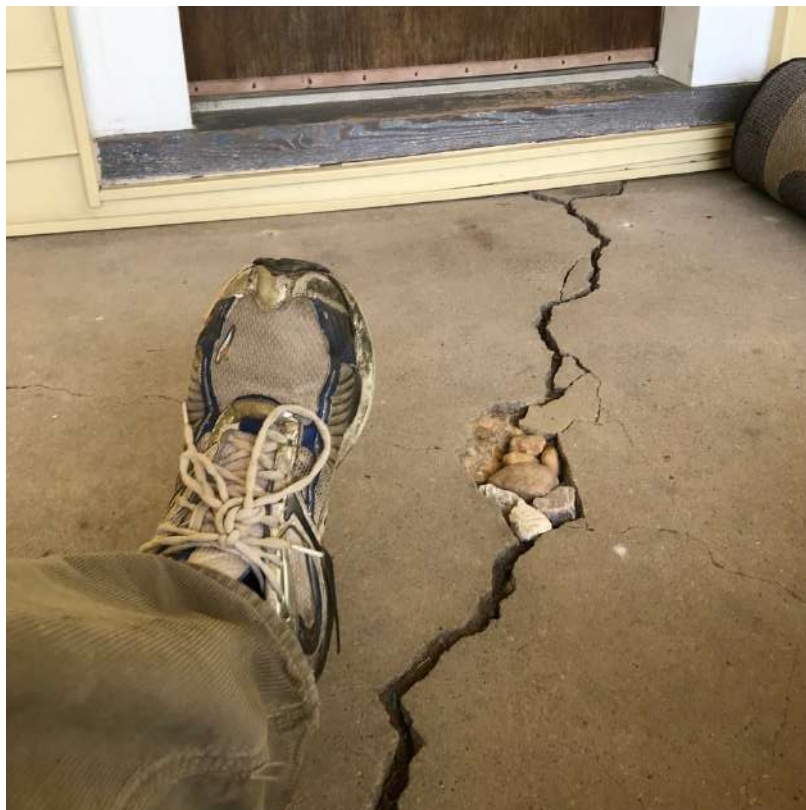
SYCAMORE AVE. PORCH FOUNDATION CRACKS
